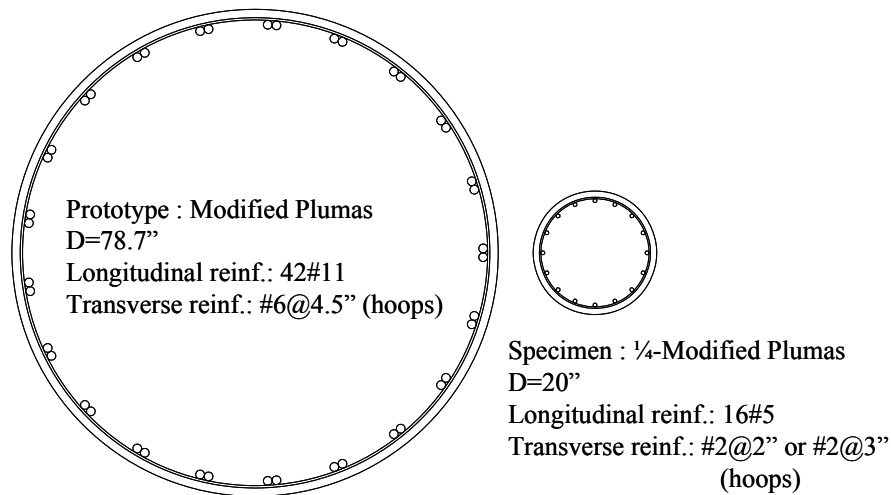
Prototype and test specimen column cross-sections (1"=25.4 mm)
